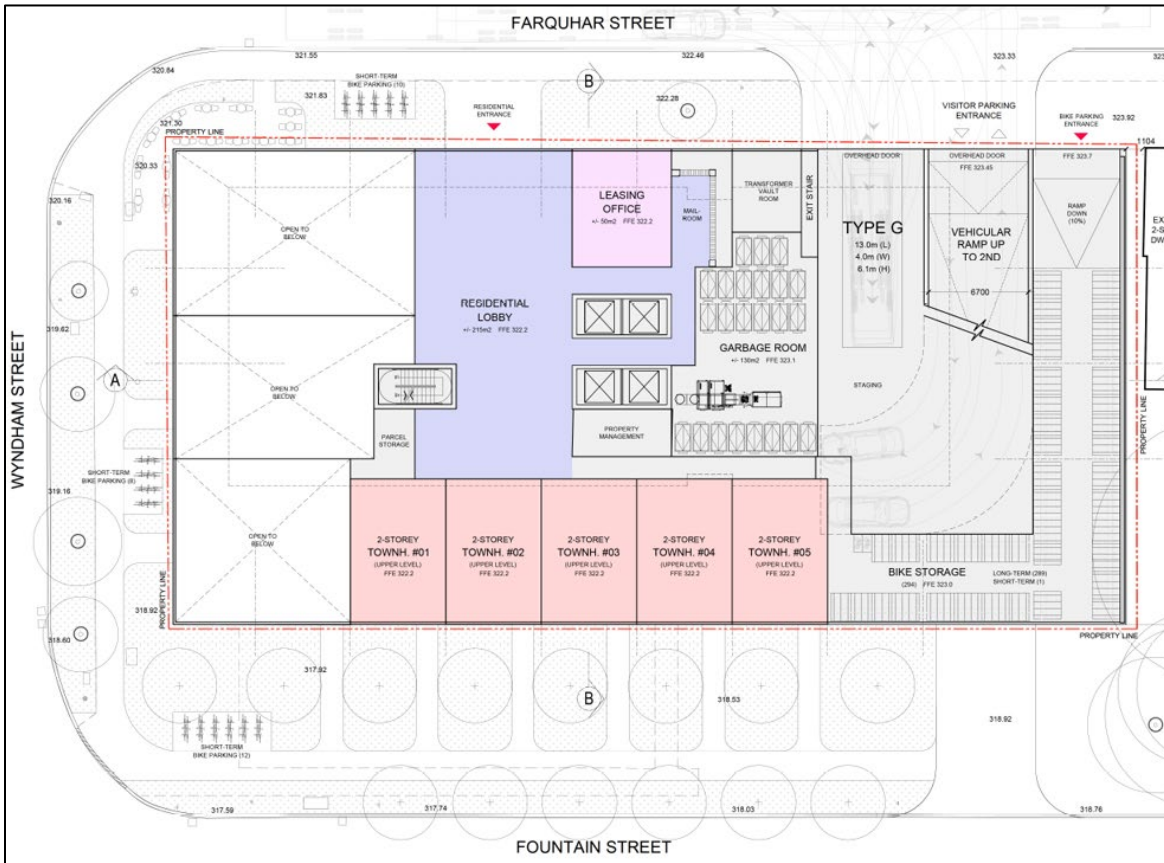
Upper Ground Floor Plan (Source: Hariri Pontarini Architects)
